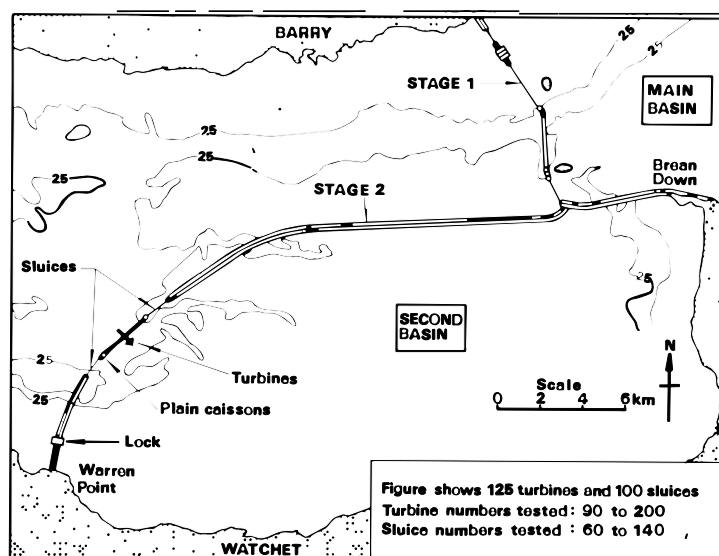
(1): Two-basin ebb and flood scheme: plan
